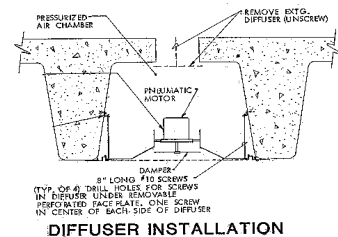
Construction drawing of the motorized damper replacement for the lower level ceiling areas in the original building.
